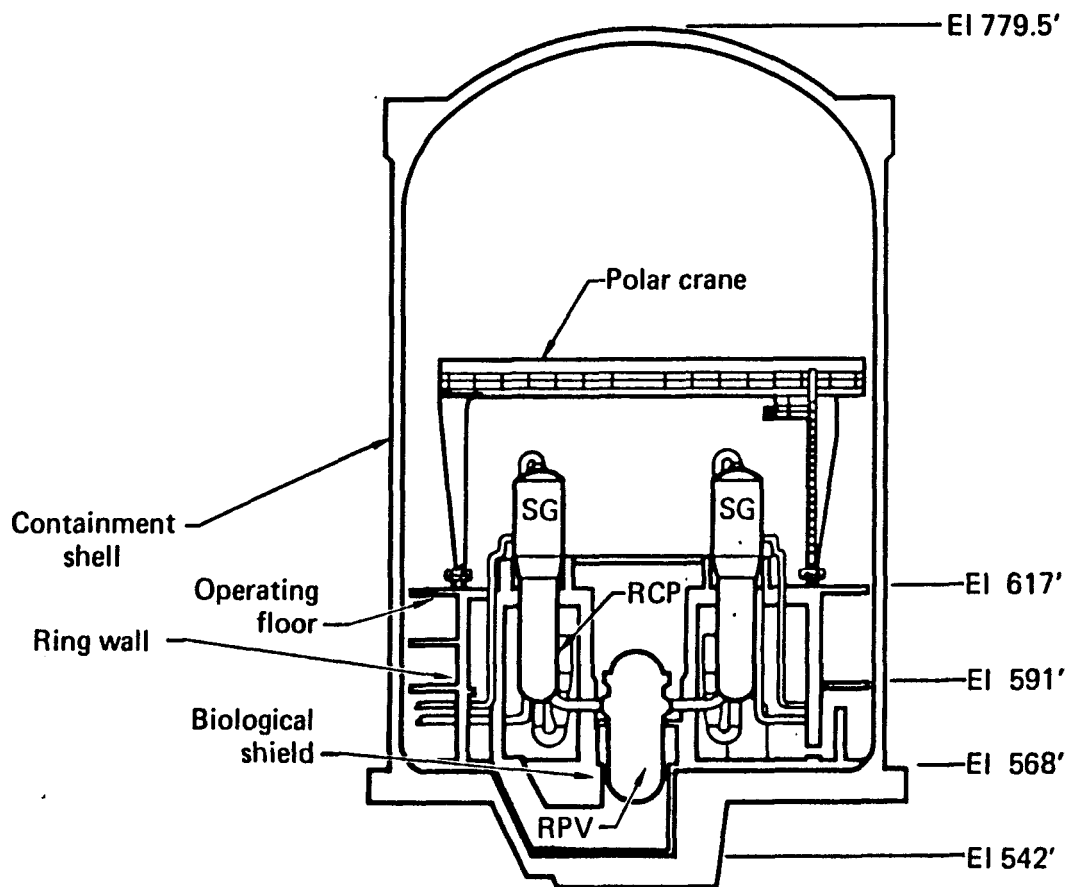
Schematic elevation of the Zion Unit 1 containment.
